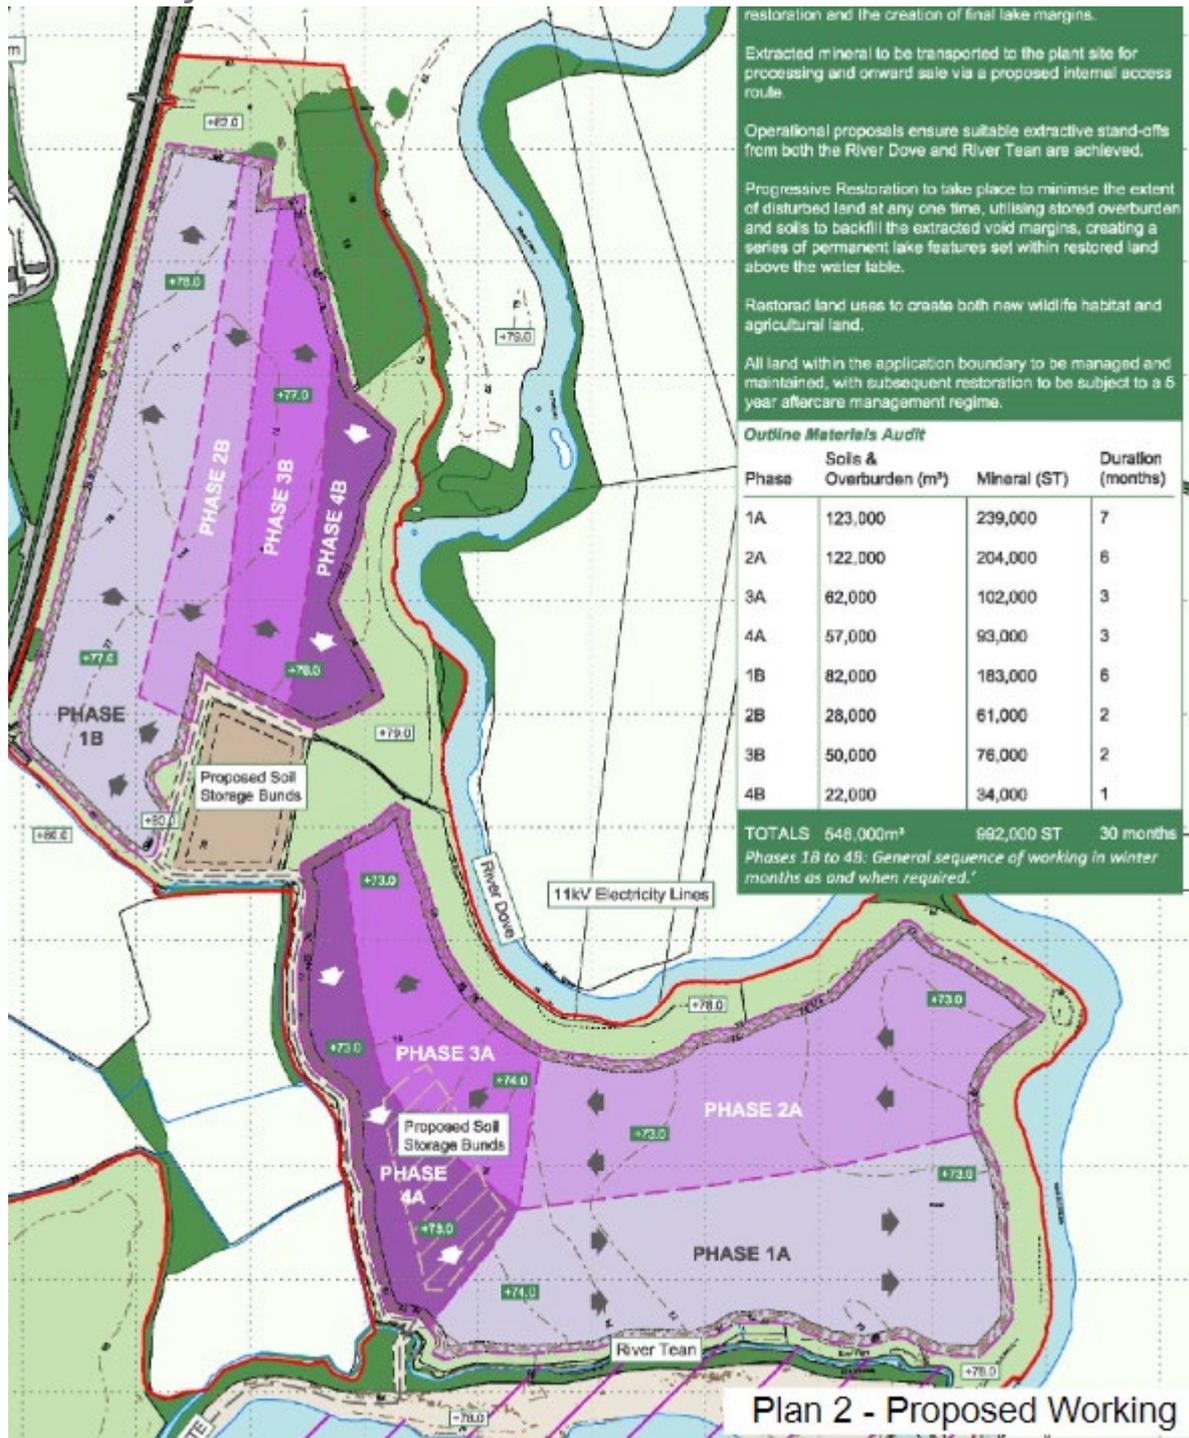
Extract from Proposals Plan showing two extraction areas and phasing.
